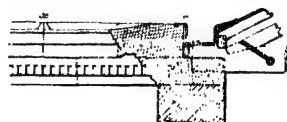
Stone Cornice. Sectional Elevation showing Saddled Joint at x.
